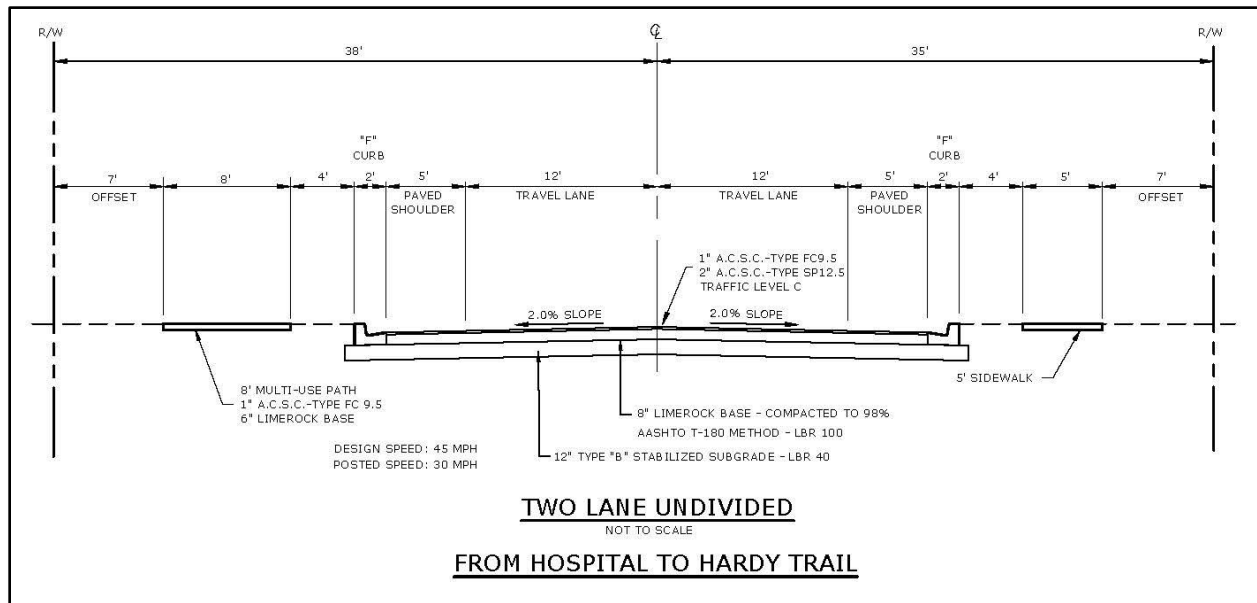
AdventHealth Hospital to Hardy Trail Typical Cross Section
